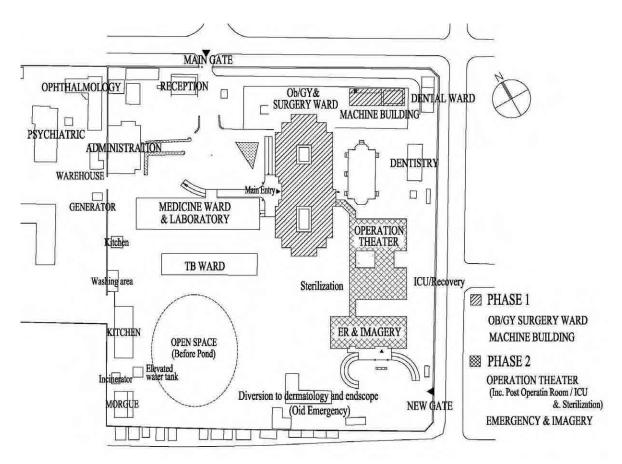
Layout Plan for Phase 2 Construction Work
